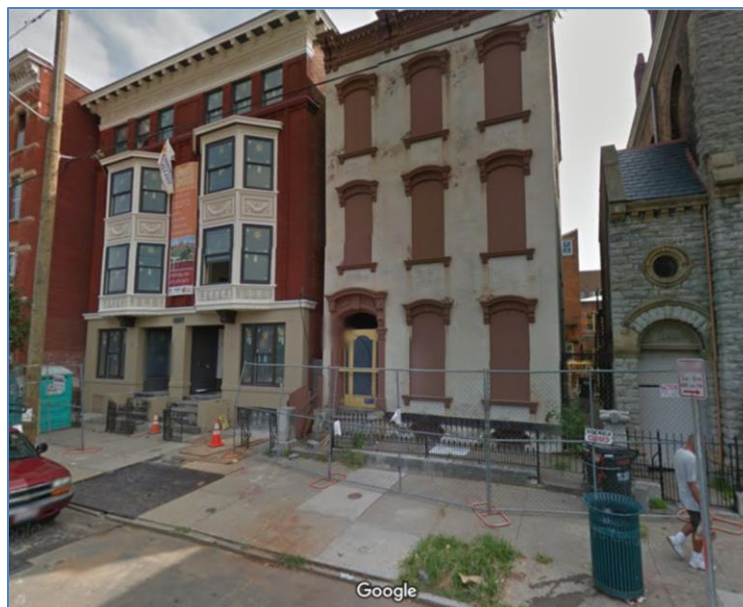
1316-1318 Race Street. Image from Google Street Views.
